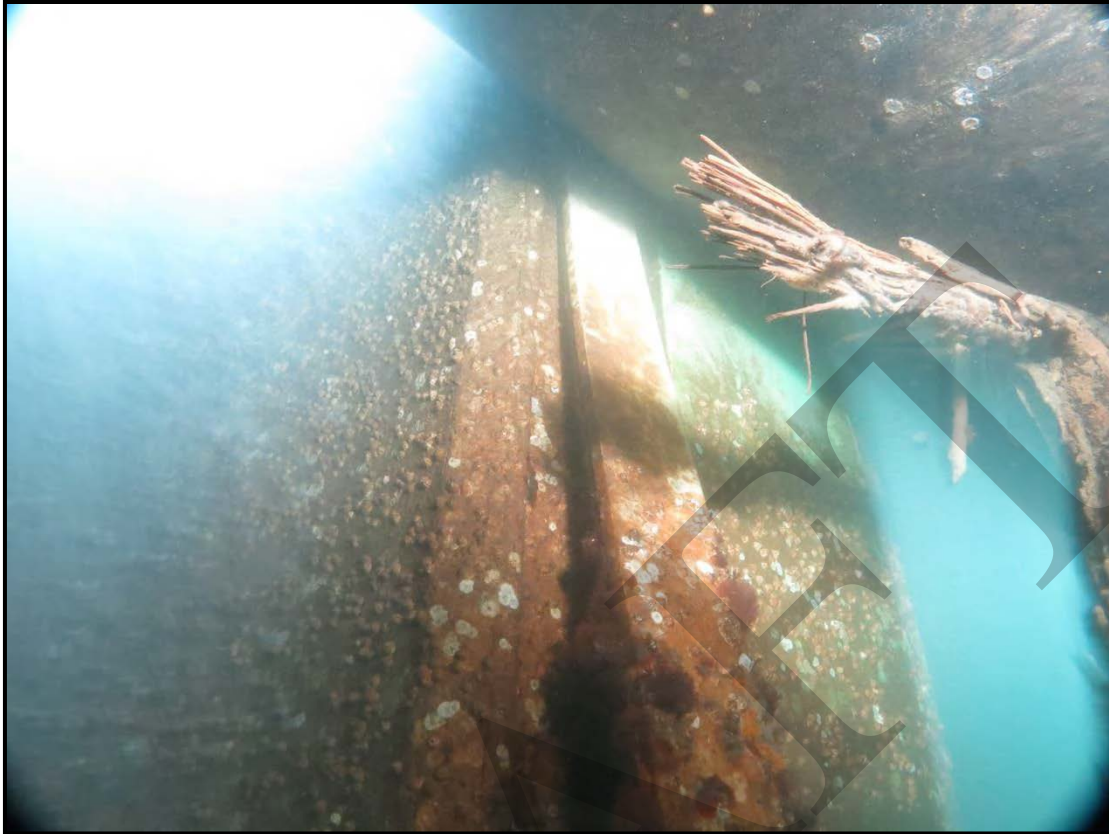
Displaced plastic guide between king pile and concrete infill panel.
